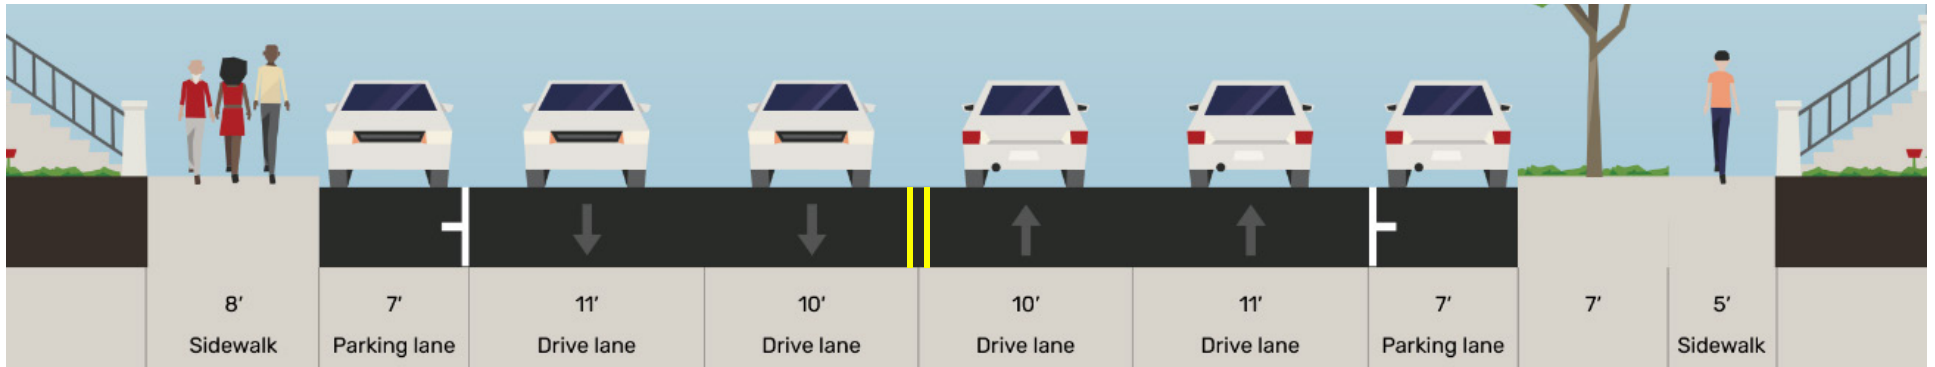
Existing cross-section: W 120th St from west City limits to Inglewood Ave
